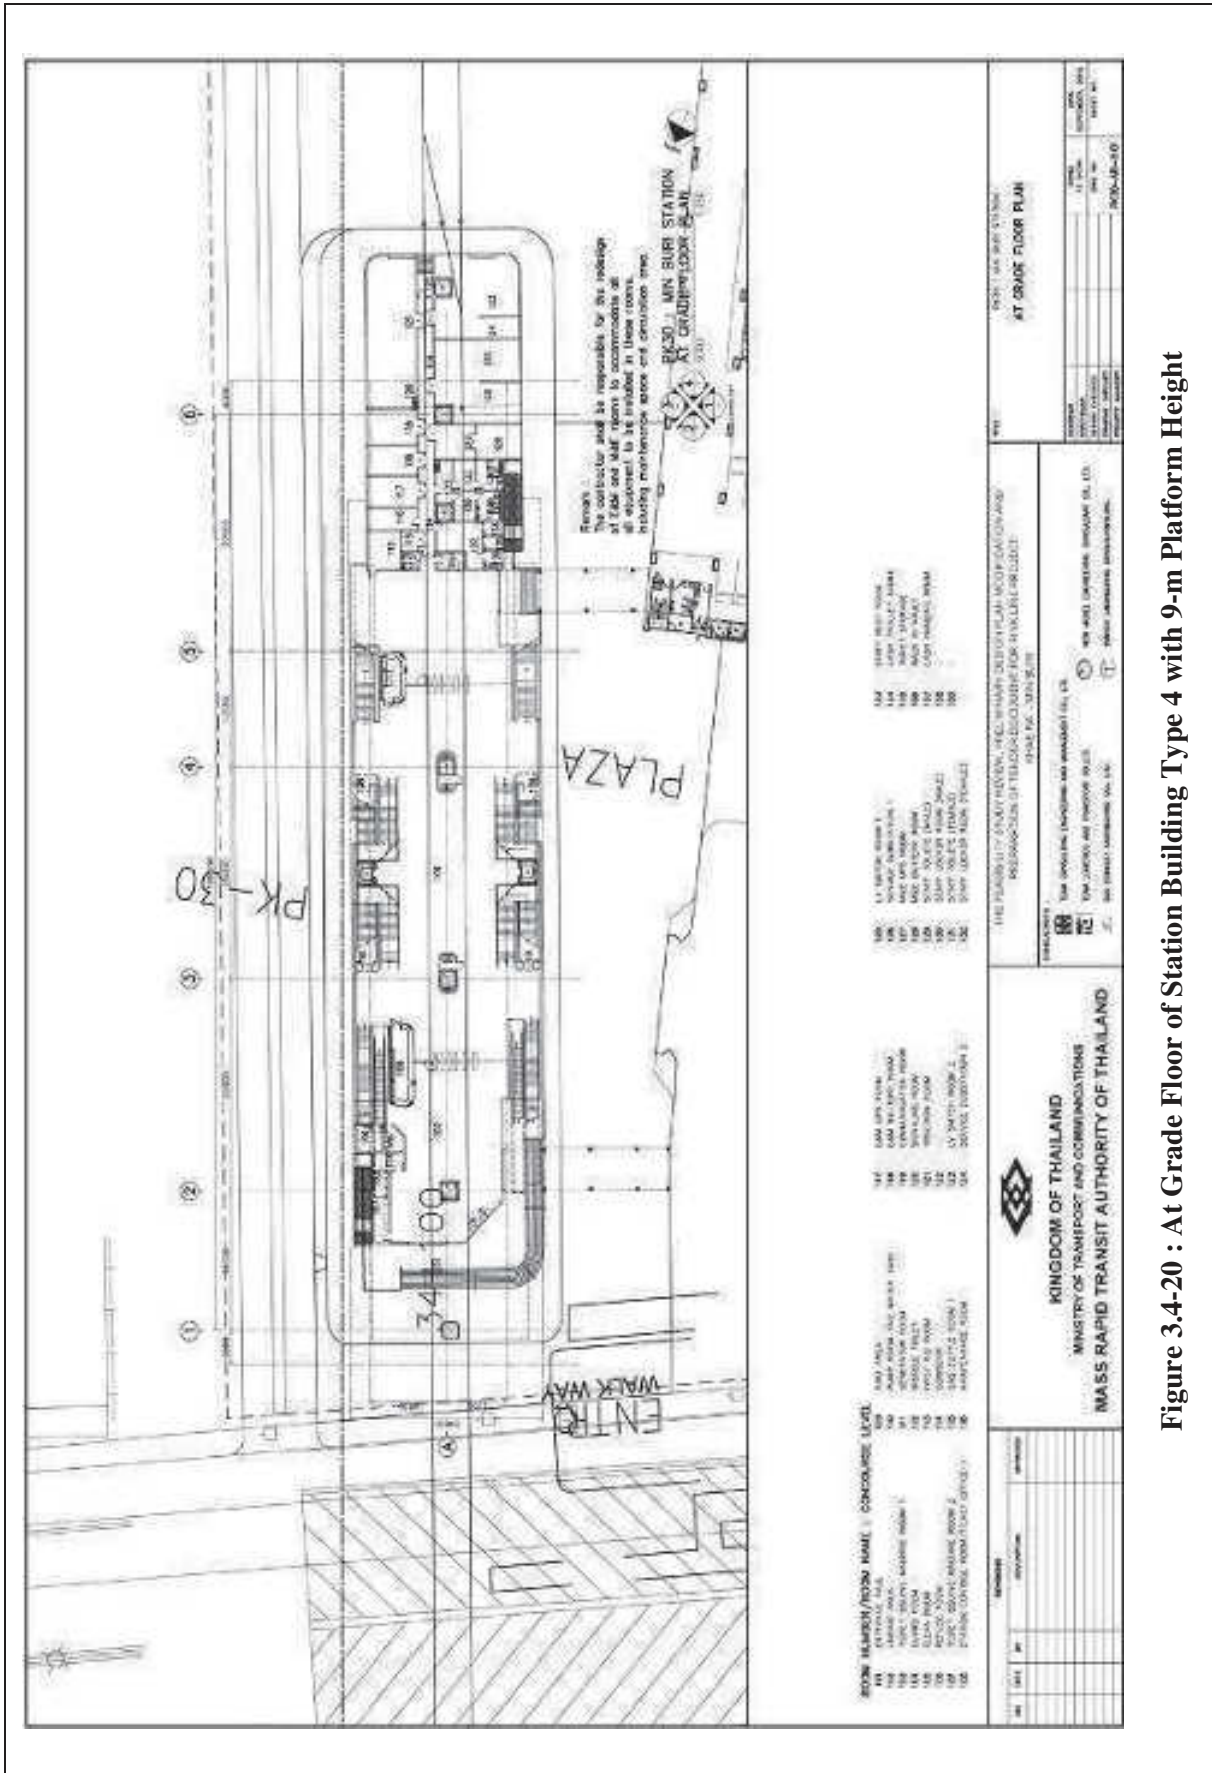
At Grade Floor of Station Building Type 4 with 9-m Platform Height
